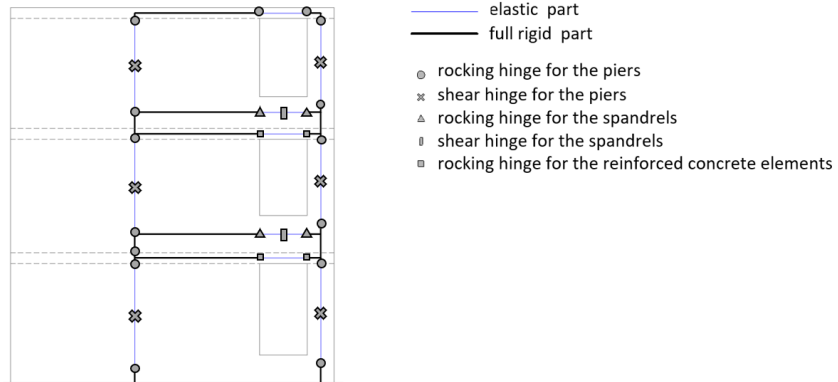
Modelling building: plastic hinges' location in the equivalent frame model of the wall façade.
